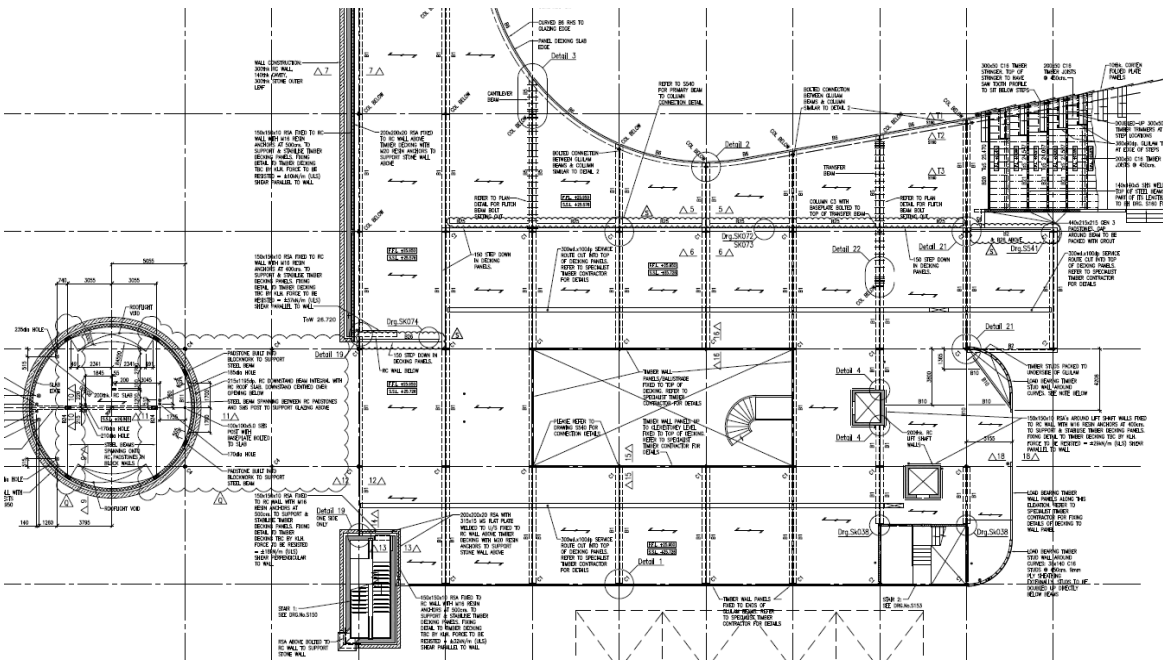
Structural arrangement at first floor level (Image copyright: Buro Happold)
